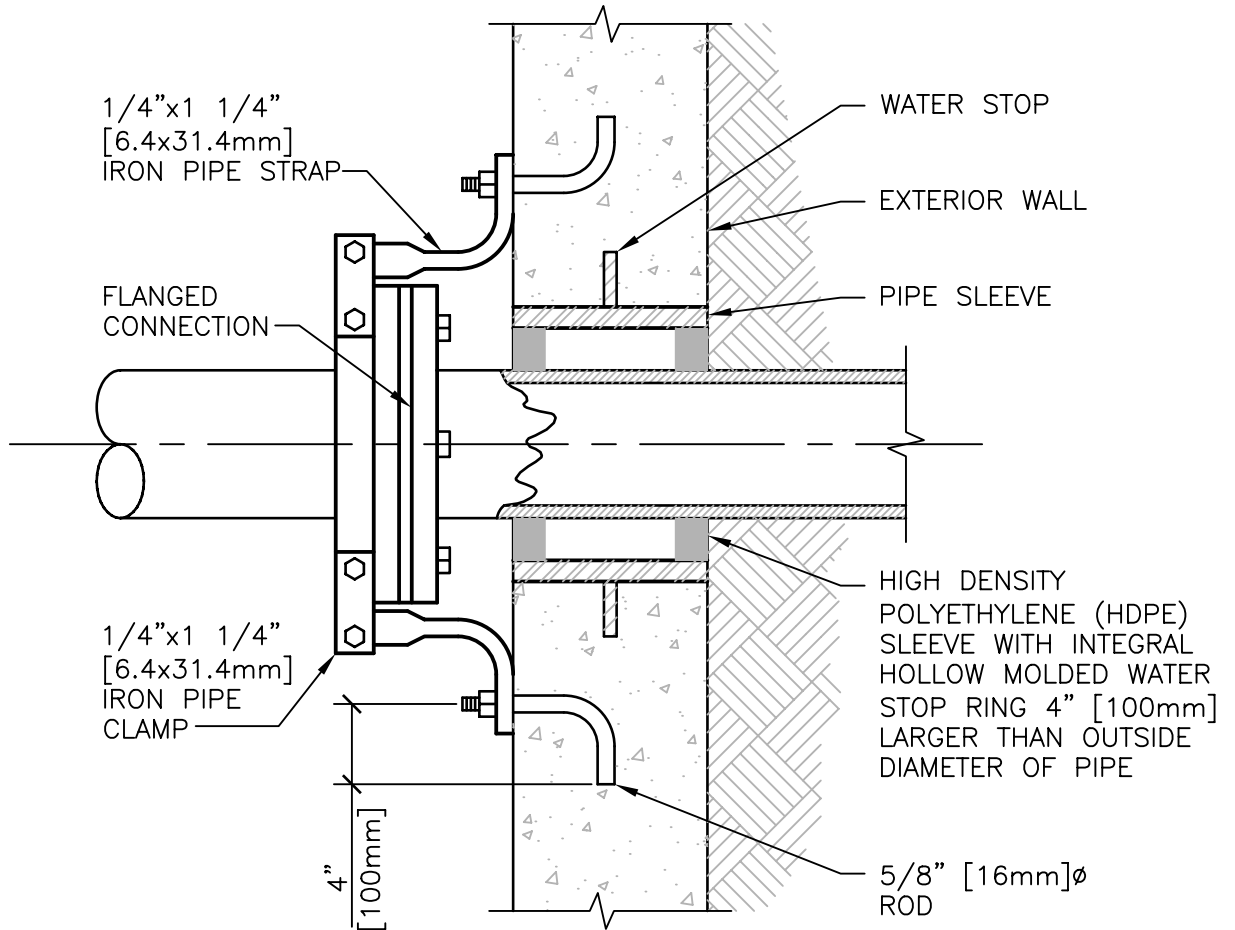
DETAIL TITLE / SUPPORT/ANCHOR FOR PIPE RISERS
